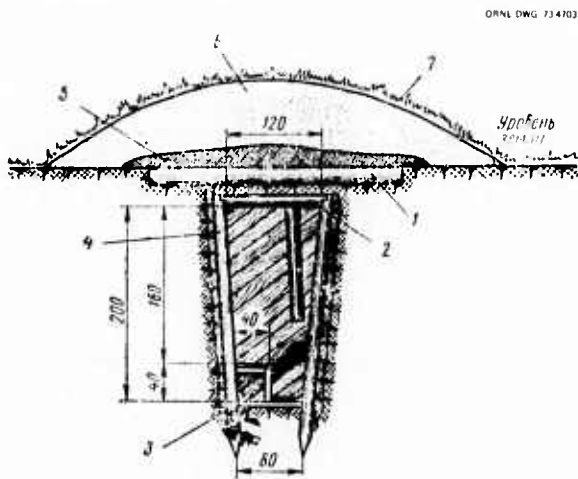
Trench: (1) roofing (diam 14 cm); (2) cross brace (diam 10 cm); (3) lining of slabs, 18 × 2; (4) stud; (5) compacted clay (20 cm layer); (6) earth covering (60–80 cm); (7) sod.
